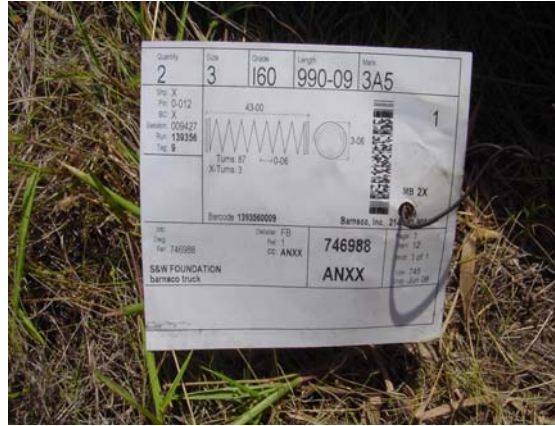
Test Shaft Steel Reinforcement Cage Construction
